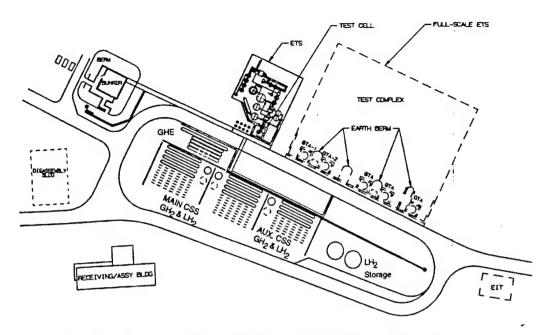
Saddle Mountain Test Site Located at Nevada Test Site
